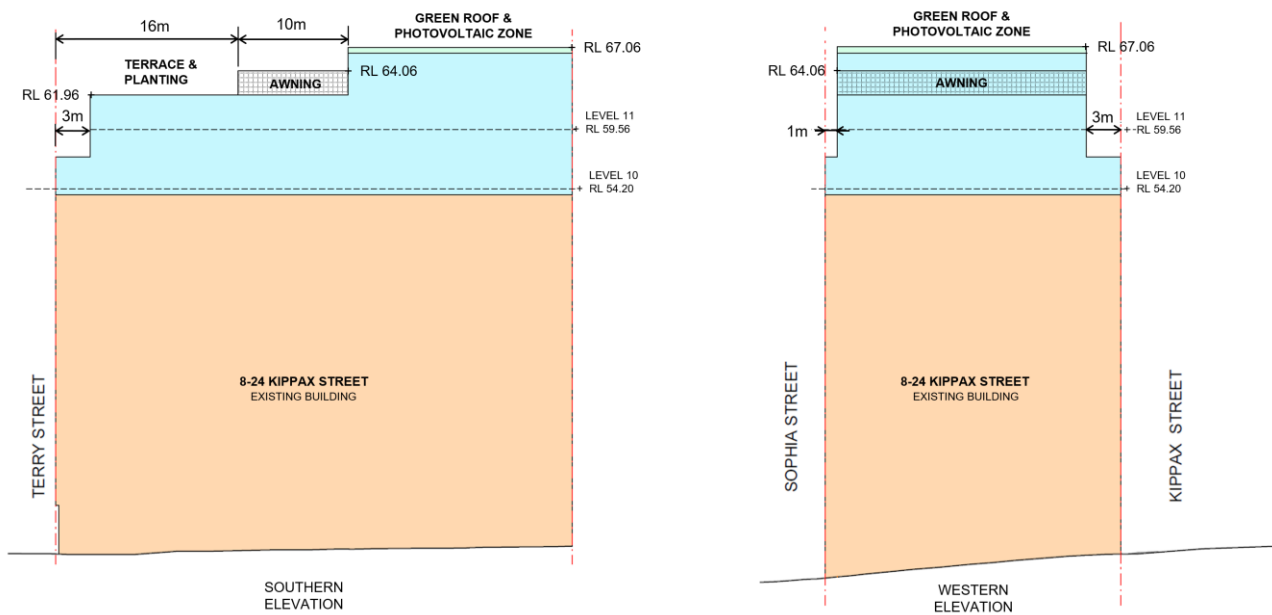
xx 8-24 Kippax Street, Surry Hills – envelope elevations
